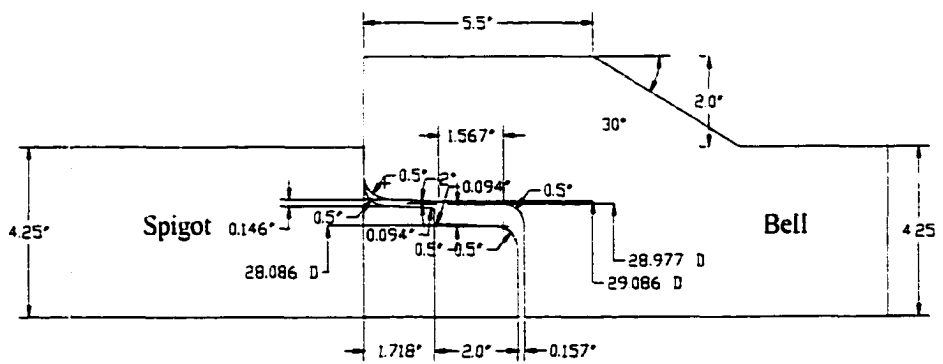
Dimensions of the single-offset joint to be manufactured (Forsheda, Inc. 1998)
